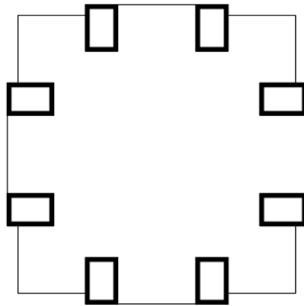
Floor plan for the 800 meter prototype building (Tyréns)
